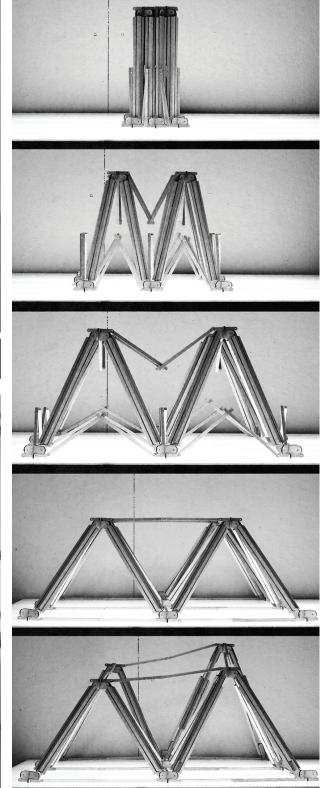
"02/20: UNDULATING SPACE FRAME" designed by Adam Achrati
